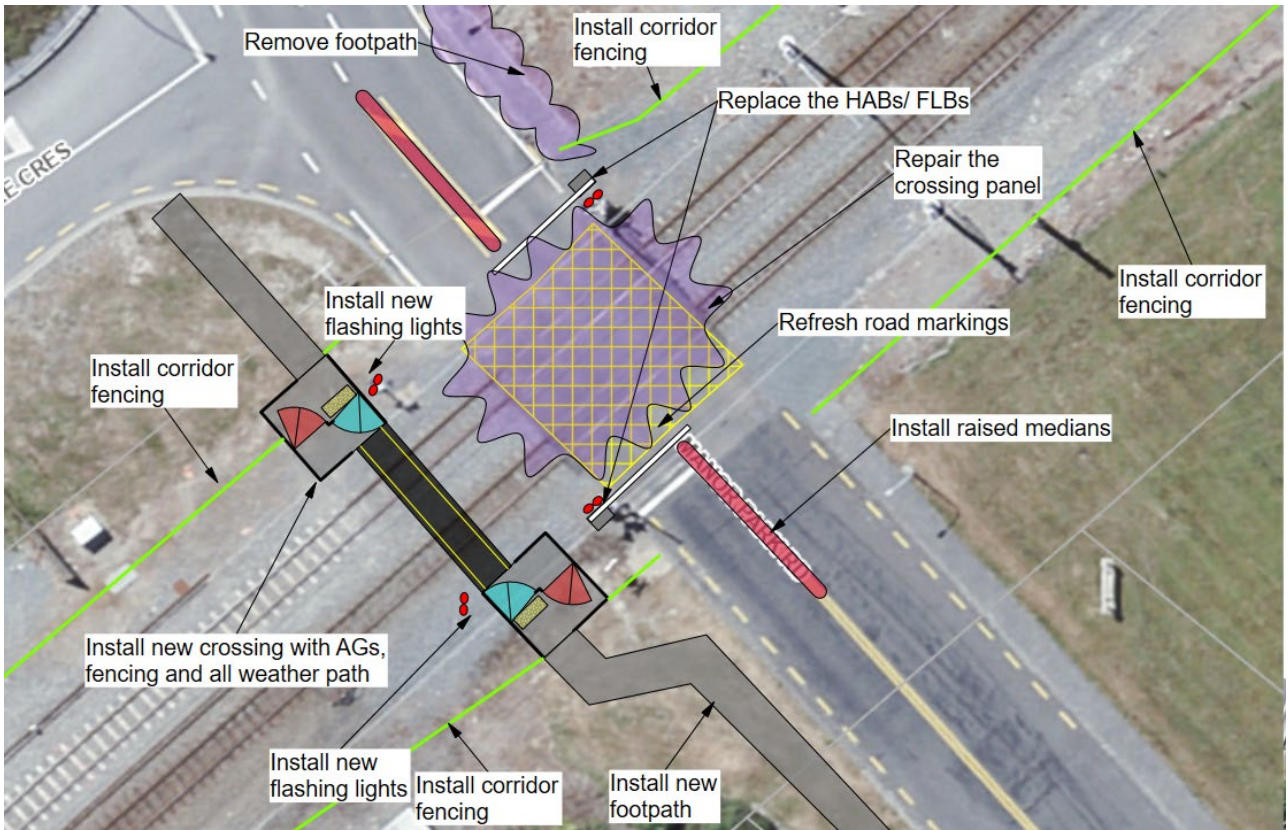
Recommendations for the Manor Park Road Level Crossing
